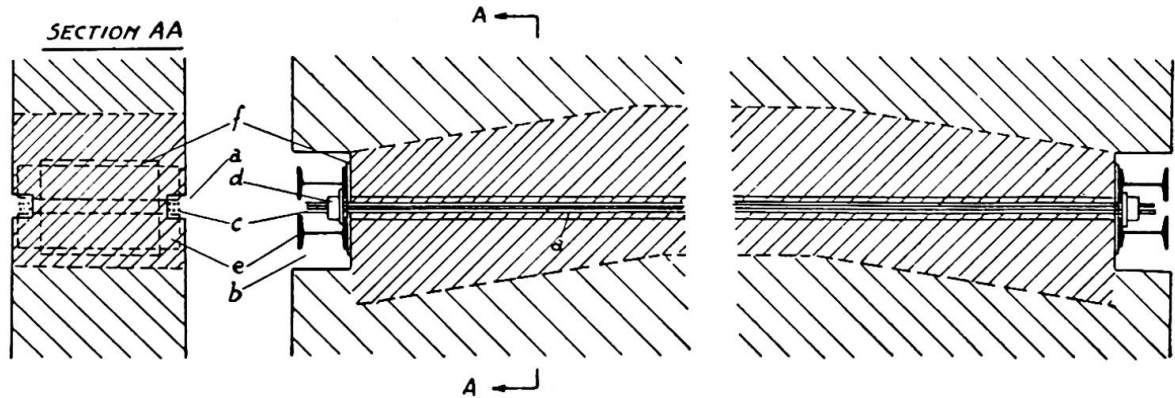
Diagram showing the formation of a prestressed beam in a wall.
